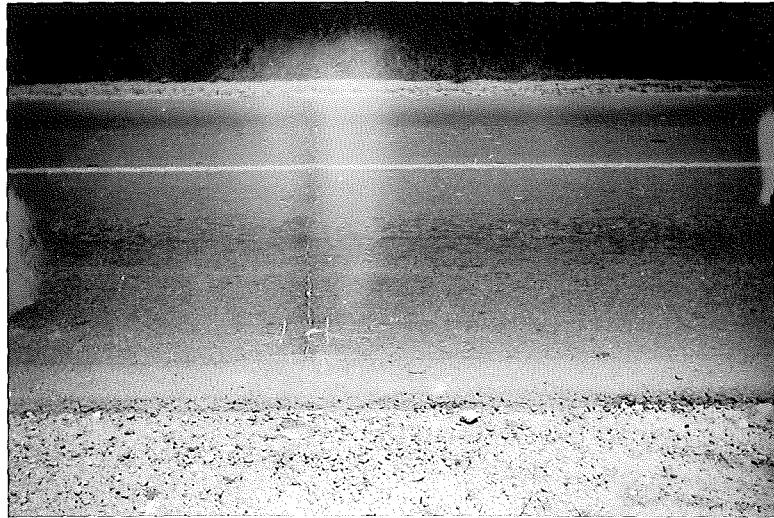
Heave due to extruding joint filler which extends entirely across pavement. Area is 8" wide and 1" high. Project 70-12, OZ.
